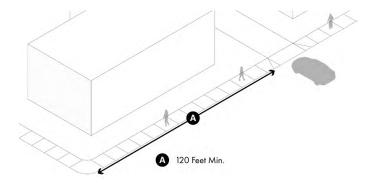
Curb cuts shall not be located closer than 120 feet from a curb return.
